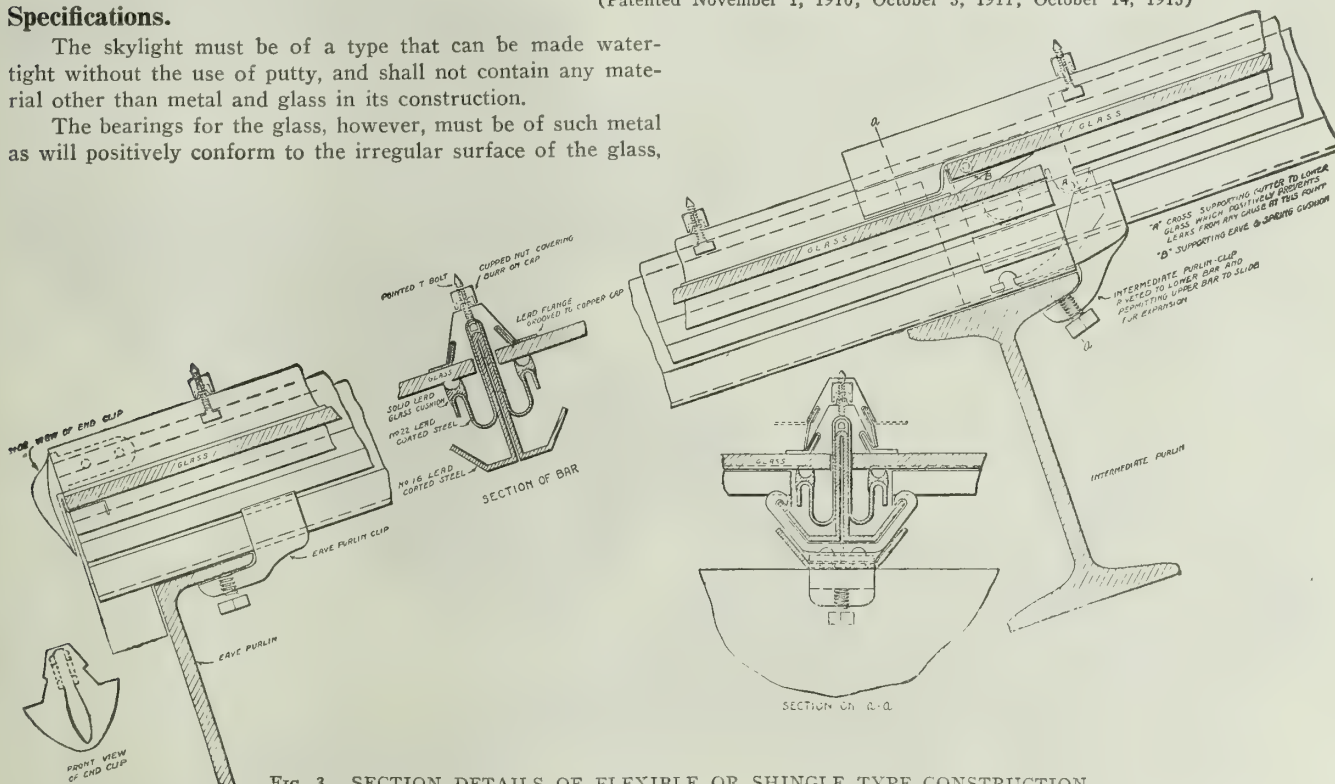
SECTION DETAILS OF FLEXIBLE OR SHINGLE TYPE CONSTRUCTION
